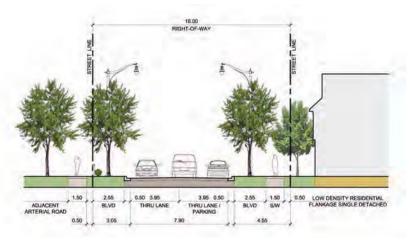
Conceptual typical treatment for Window Streets with 2 thru lanes, parking on one side and street trees in grass boulevard.
